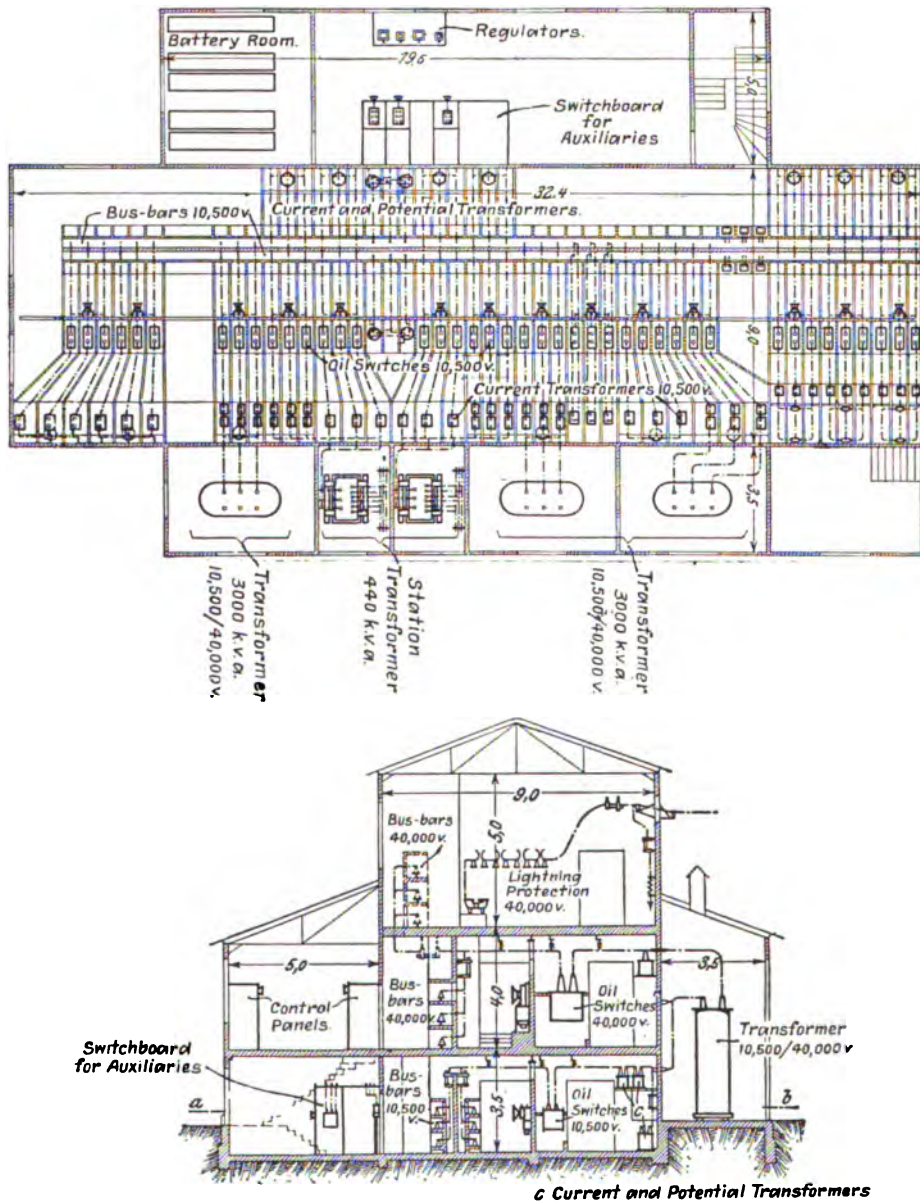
Brakpan Power Station. Plan and Section of the Switch House.
